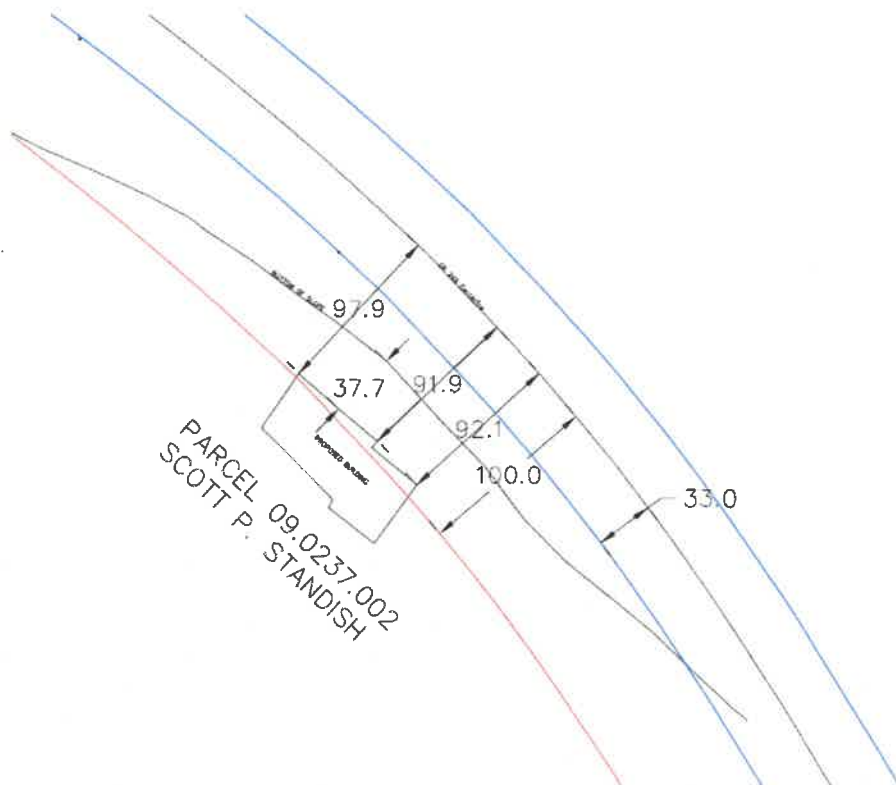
Proposed dwelling location. Building site location was gathered by the County Highway Department.
